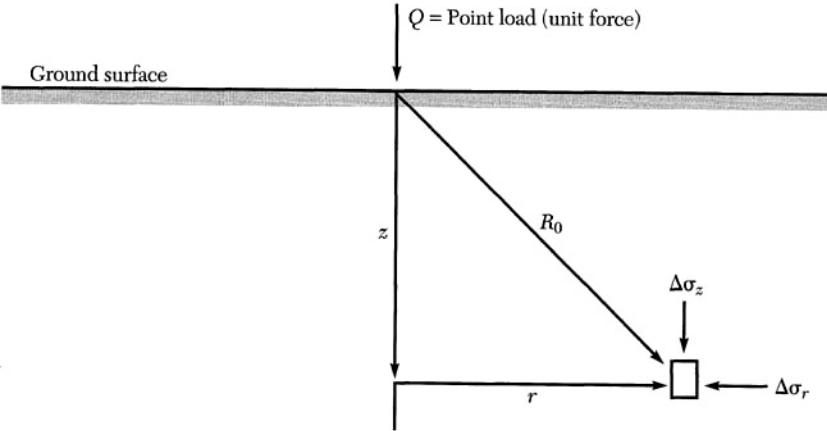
Typical cross section for a point load applied on an elastic half space.
